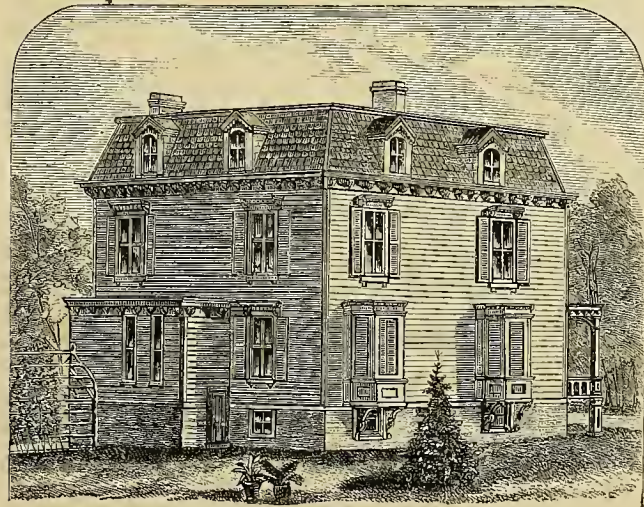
REAR OR NORTH-WEST ELEVATION.
